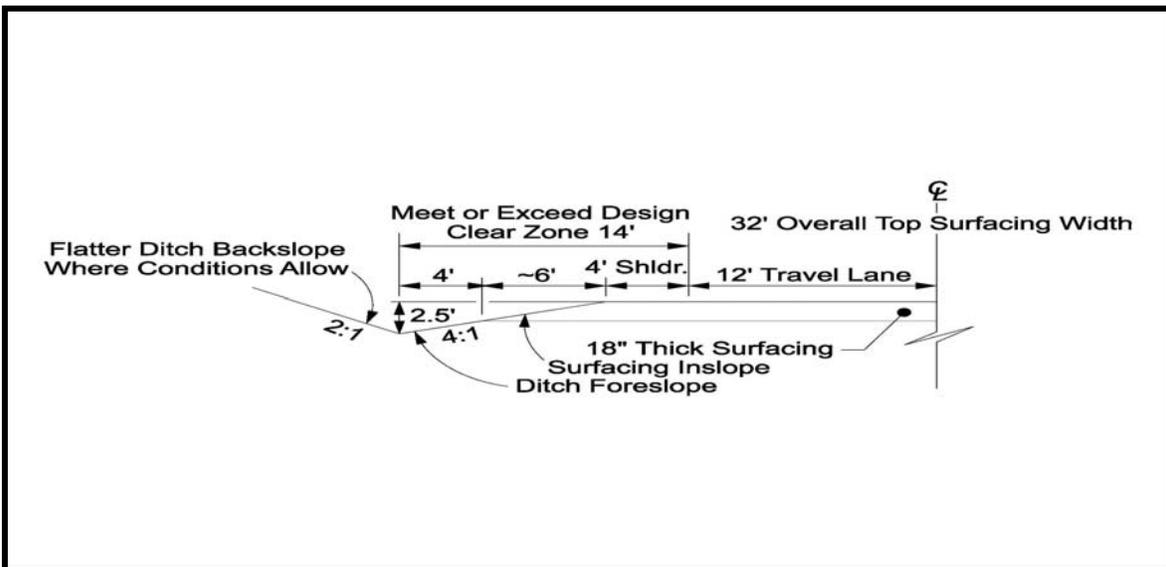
Proposed Road Template for Lake Helena Drive North of York Road.
